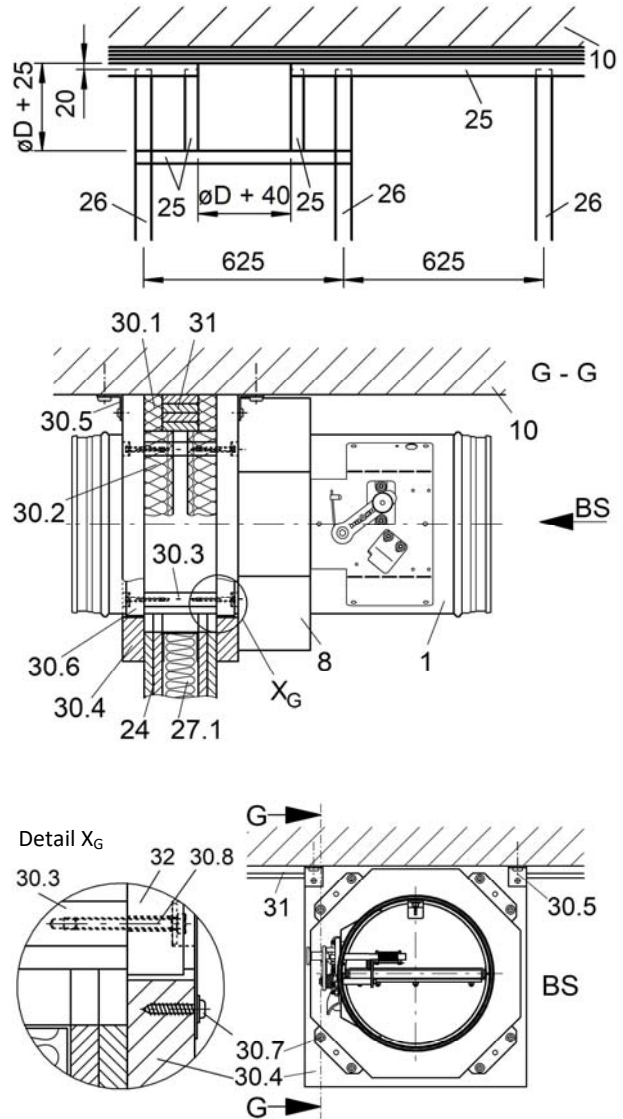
Installation kit GDL for installation in lightweight partition walls with metal posts and panelling on both sides with sliding ceiling connection
